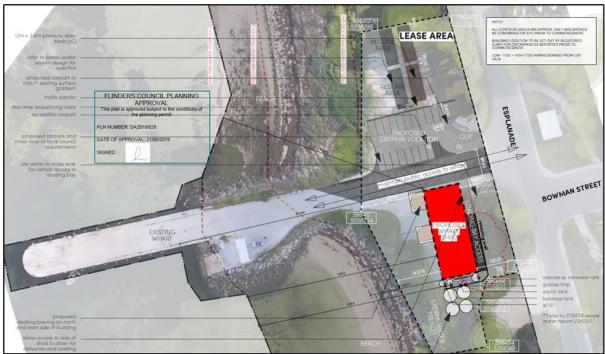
Endorsed Site Plan, DA2018/00028 approved 21 June 2018, showing vehicle parking location and configuration.
